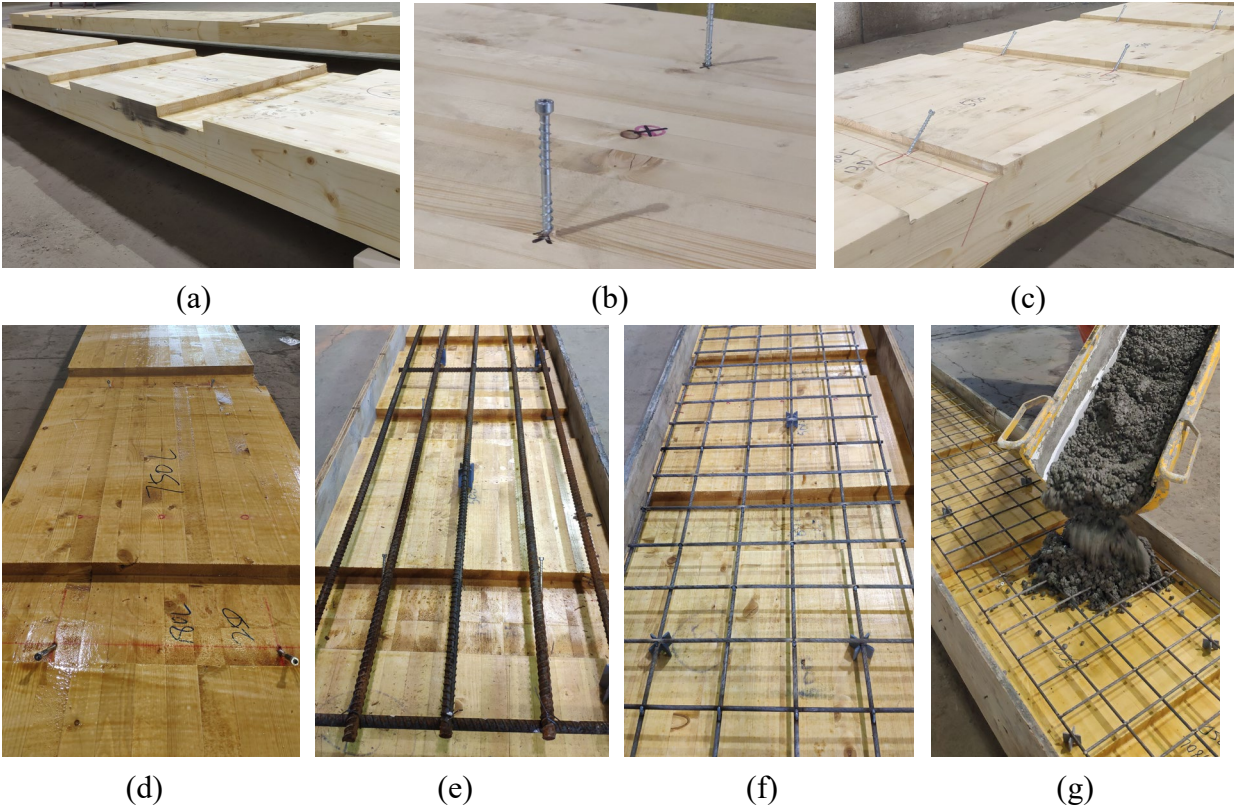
Composite floor specimen preparation (a) Notches cut on the GLT panels; (b) Screws installed at mid-span of floors; (c) Screws installed in the notches; (d) Timber treated with waterproof sealer; (e) Steel rebar in specimen SPU-9; (f) Wire mesh in rest of the specimens; and (g) Concrete casting
